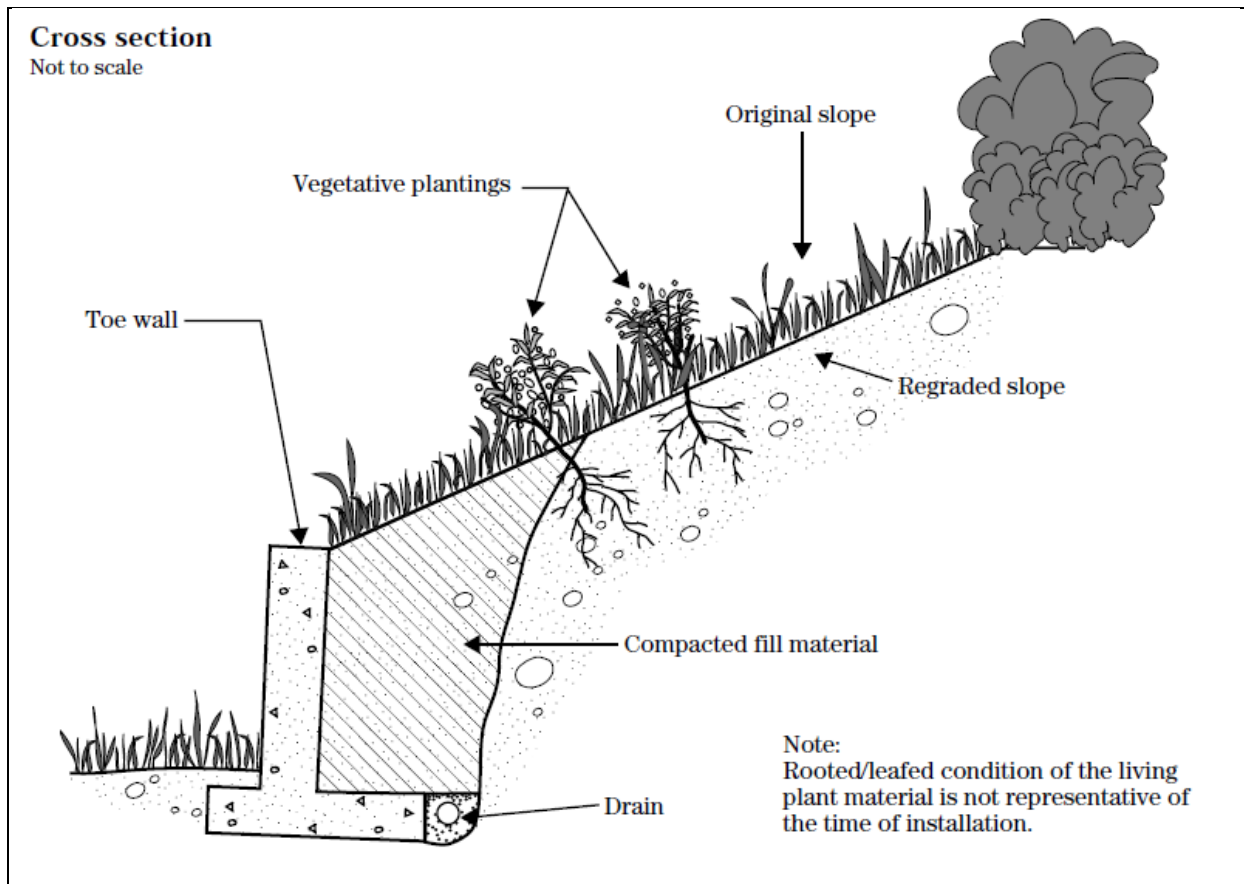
CROSS SECTION OF A LOW WALL WITH VEGETATION PLANTED ON THE SLOPE FOR STABILIZATION. TAKEN FROM (SOTIR AND GRAY, 1992).
